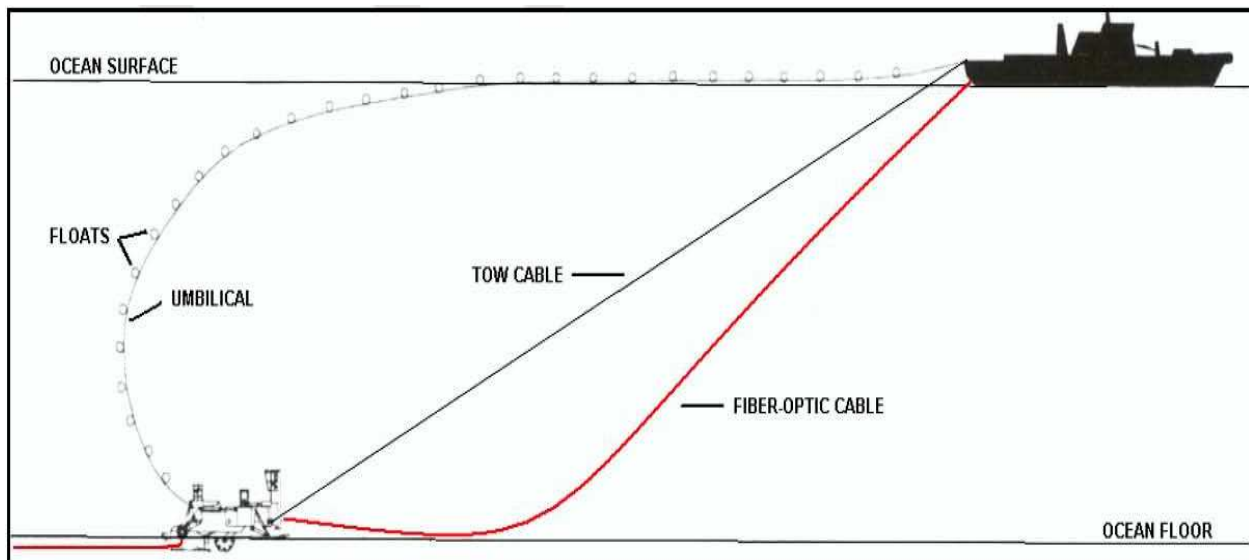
Cable Installation and Plough Burial (Source: TESSubCom)
